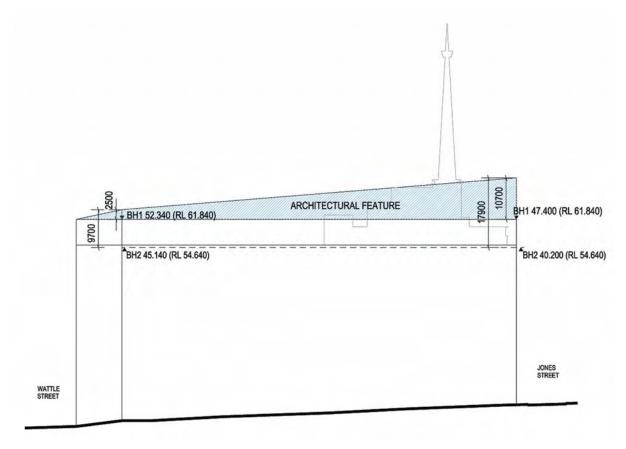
South (Broadway) elevation of architectural feature (Source: DCM)
